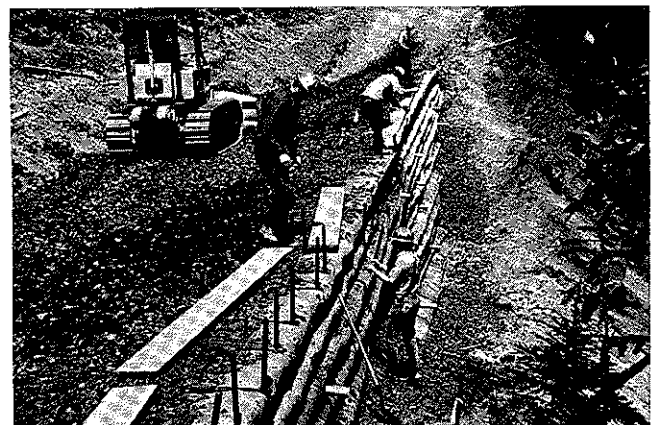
Positioning Form Supports to Start a New Wall Layer
